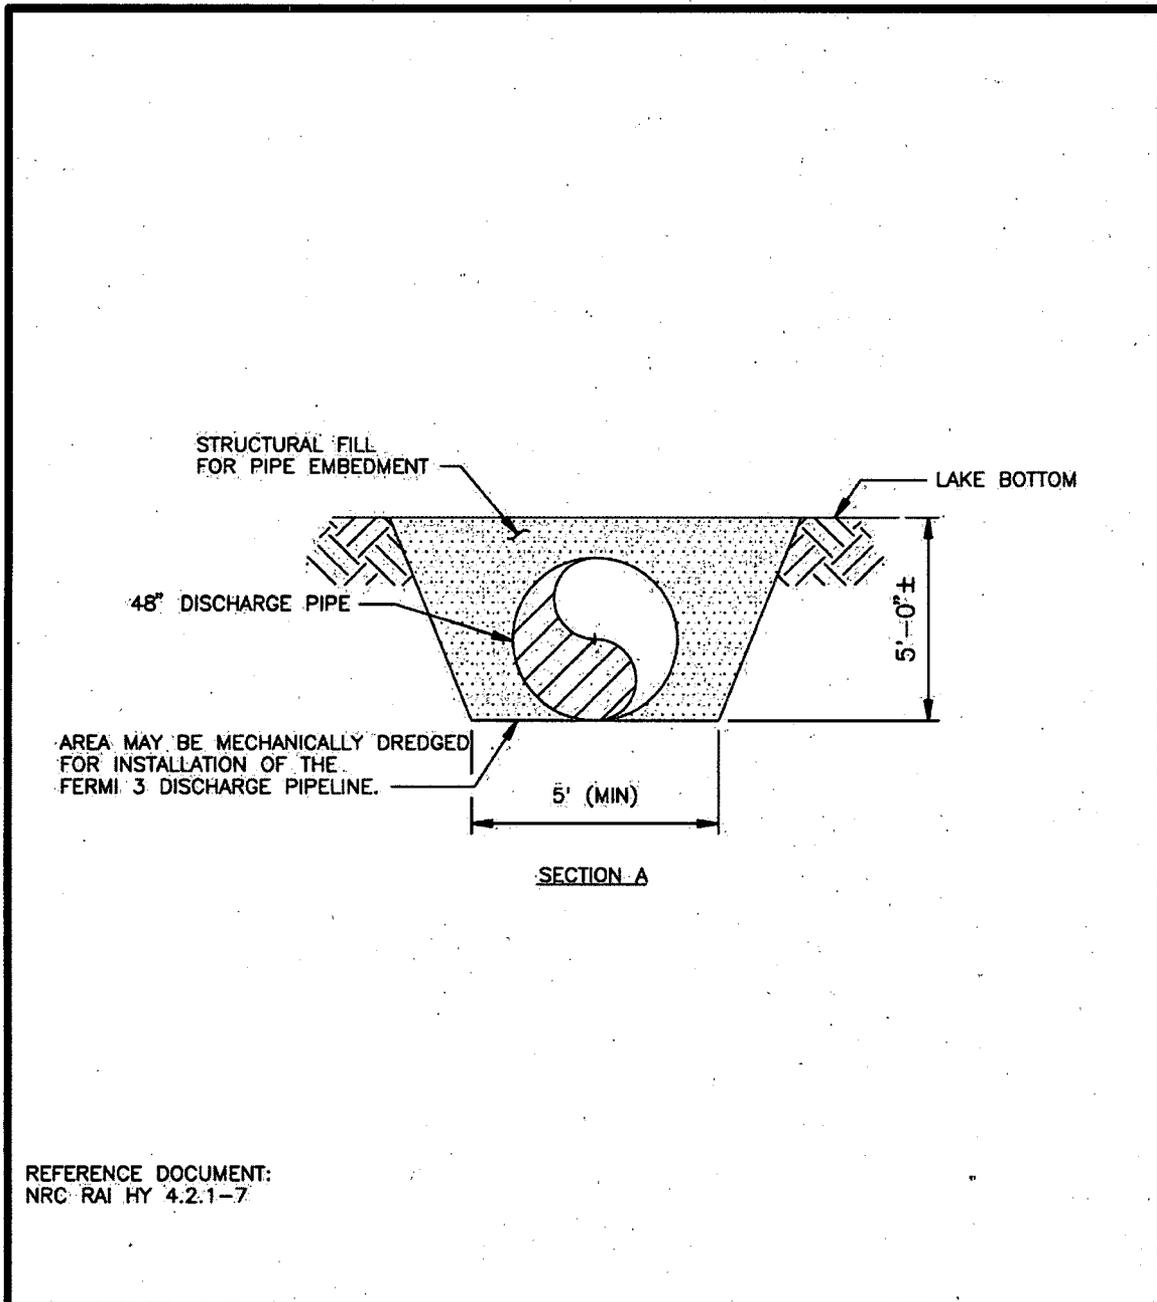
Fermi 3 Temporary Work Area Cross Section
